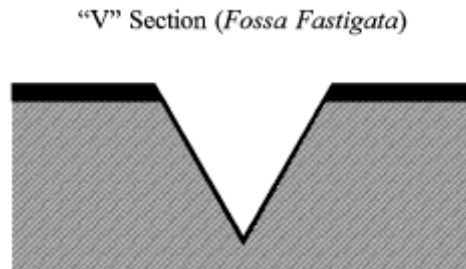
V-sectioned ditch (after Keeley *et al* 2007, 59).
